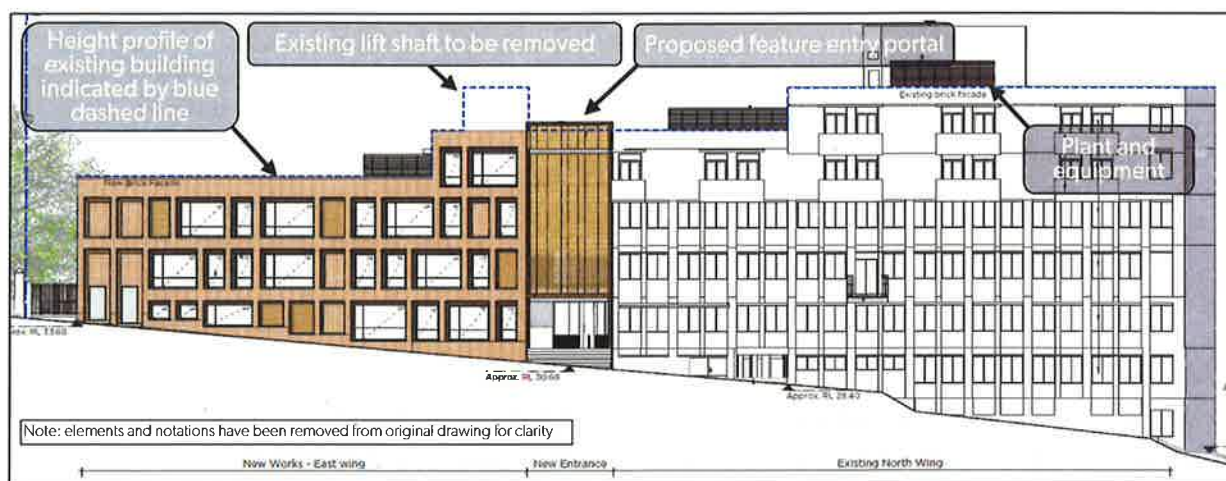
| Northern elevation of the replacement north-east wing building (Source: Applicant's RtS 2018)
